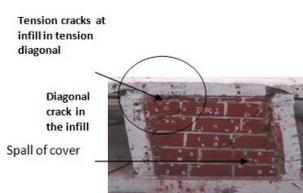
(h): Diagonal crack at infill in the final stage and spalling of concrete in beams and spalling of infill
